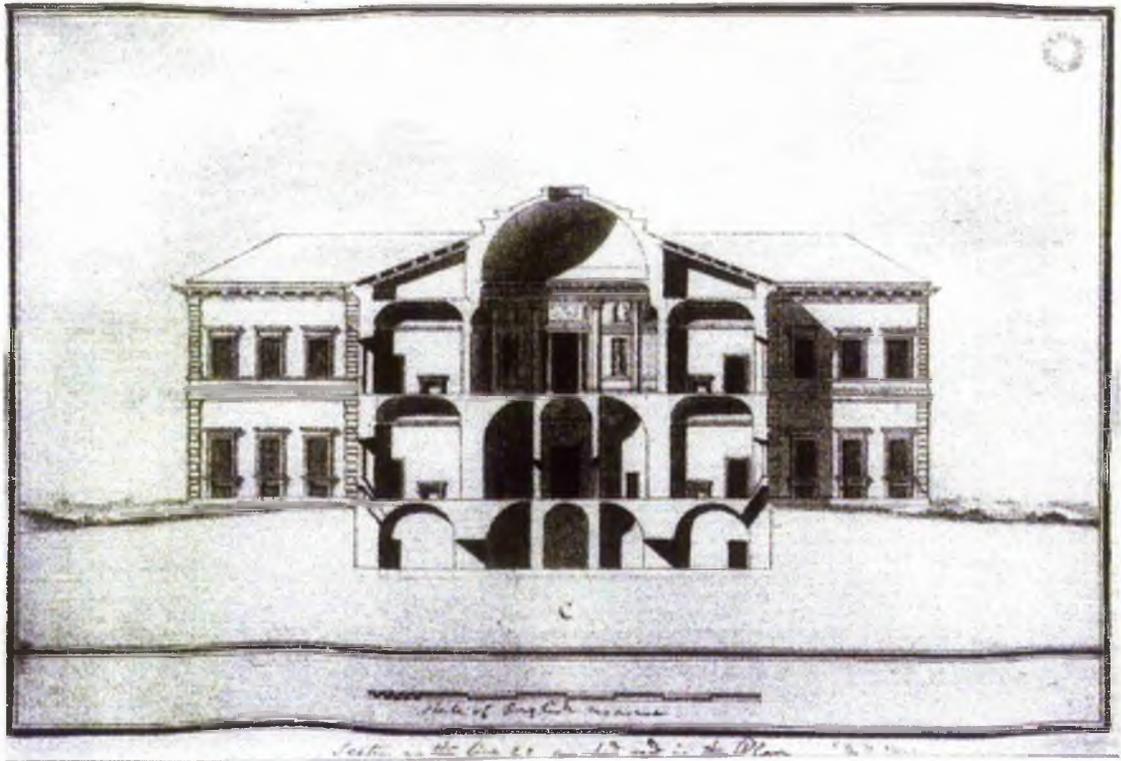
King's College. North-south section through central rotunda. J. Byres, 1785.
